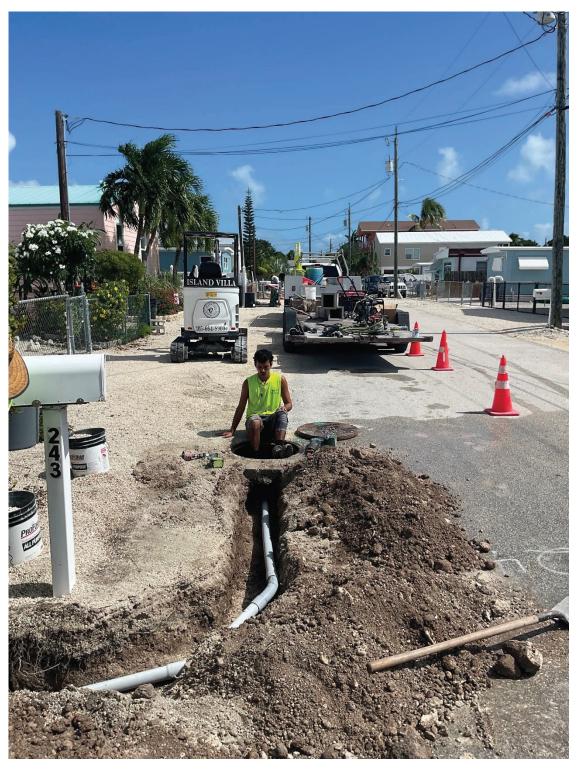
Install Conduit in Trench for Collection System Monitoring Project.
